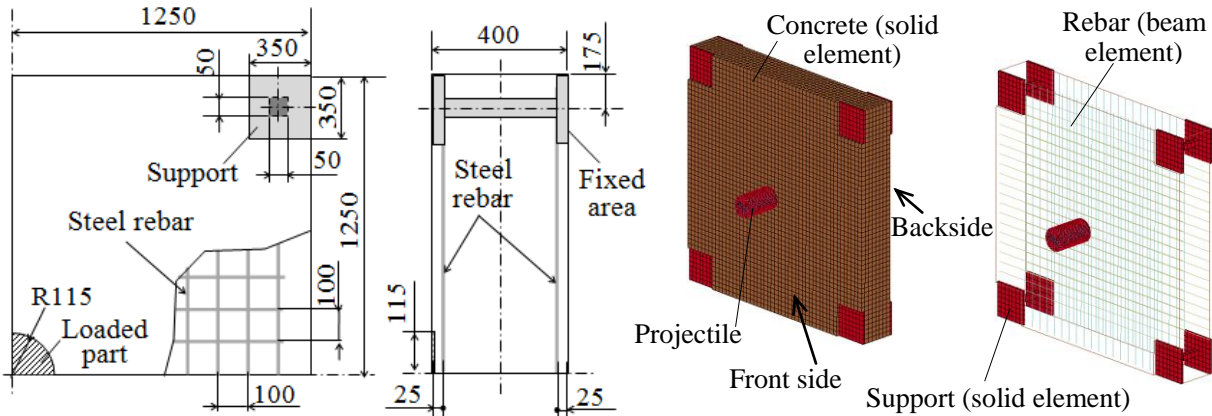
RC wall in impact test (upper right quarter) (Unit: mm) Figure 2 Simulation model of RC wall
